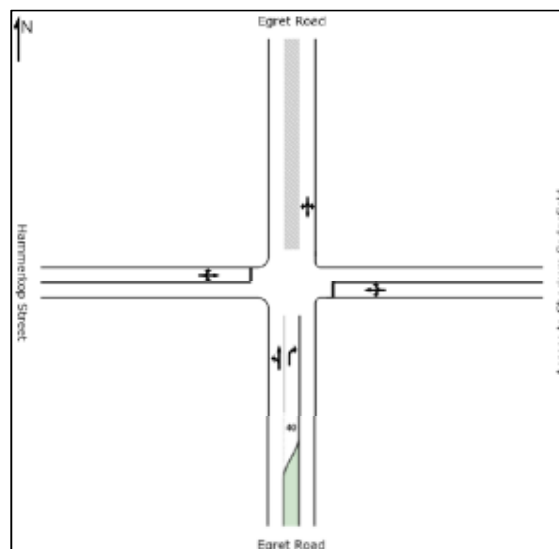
PROPOSED LAYOUT OF EGRET ROAD/HAMMERKOP STREET/ACCESS TO CHECKERS
